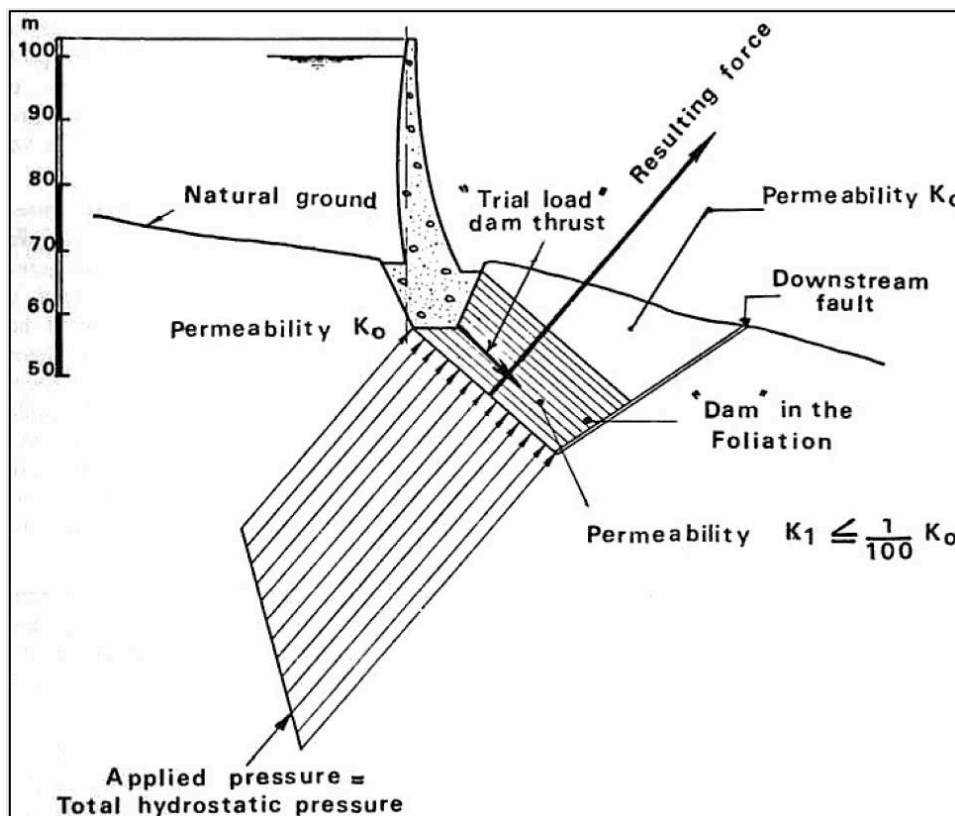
Cross section through the left abutment of Malpasset Dam (Duffaut, 2013)
